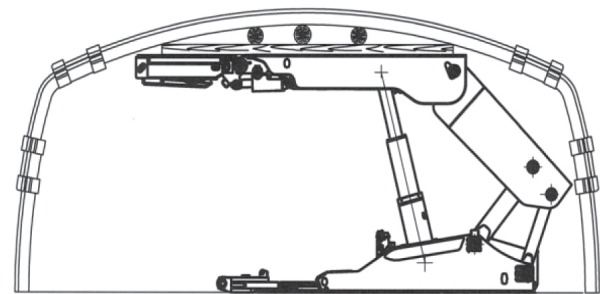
Five-element ŁPrP frame with an installed powered support unit
